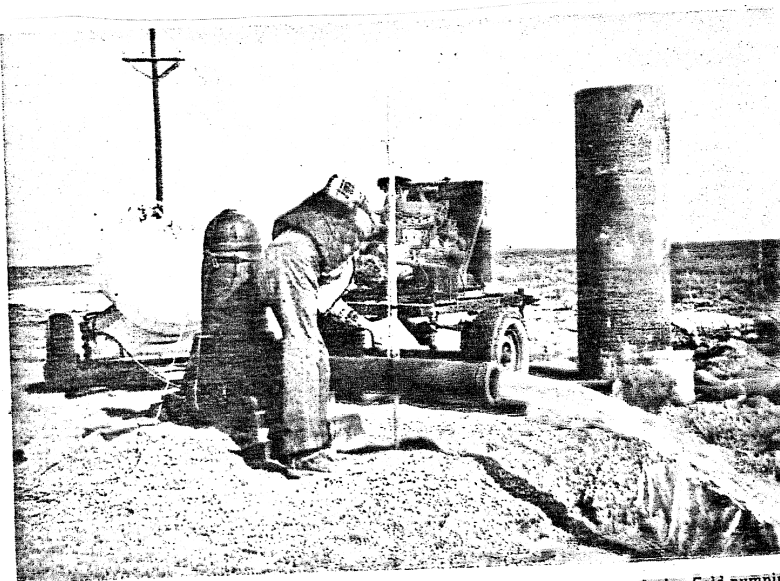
Circular orifice weir and piezometer tube installed properly and in use during field pumping test.
